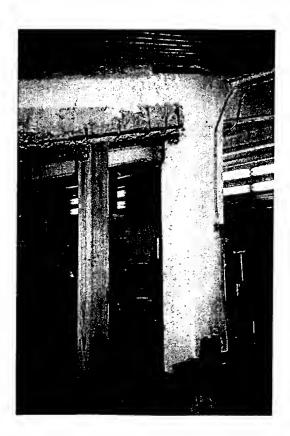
Detail view of exposed reinforcing bars and concrete spalling in interior space below east bleacher. Photo dated March 2005 by ARG.
